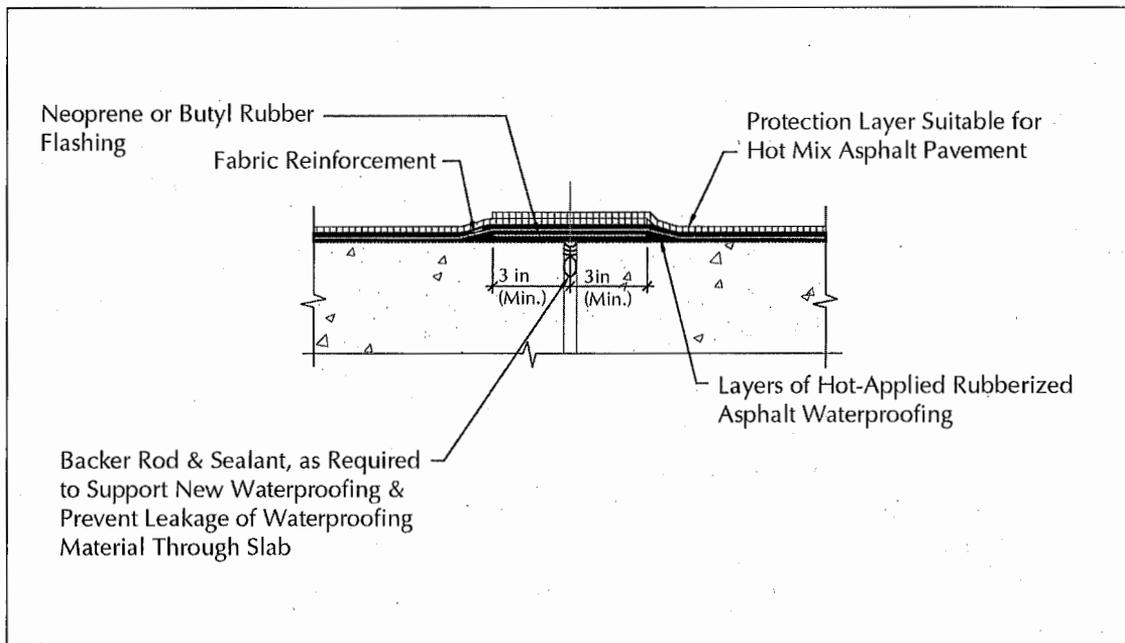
Waterproofing detail at the roof slab expansion joints.
